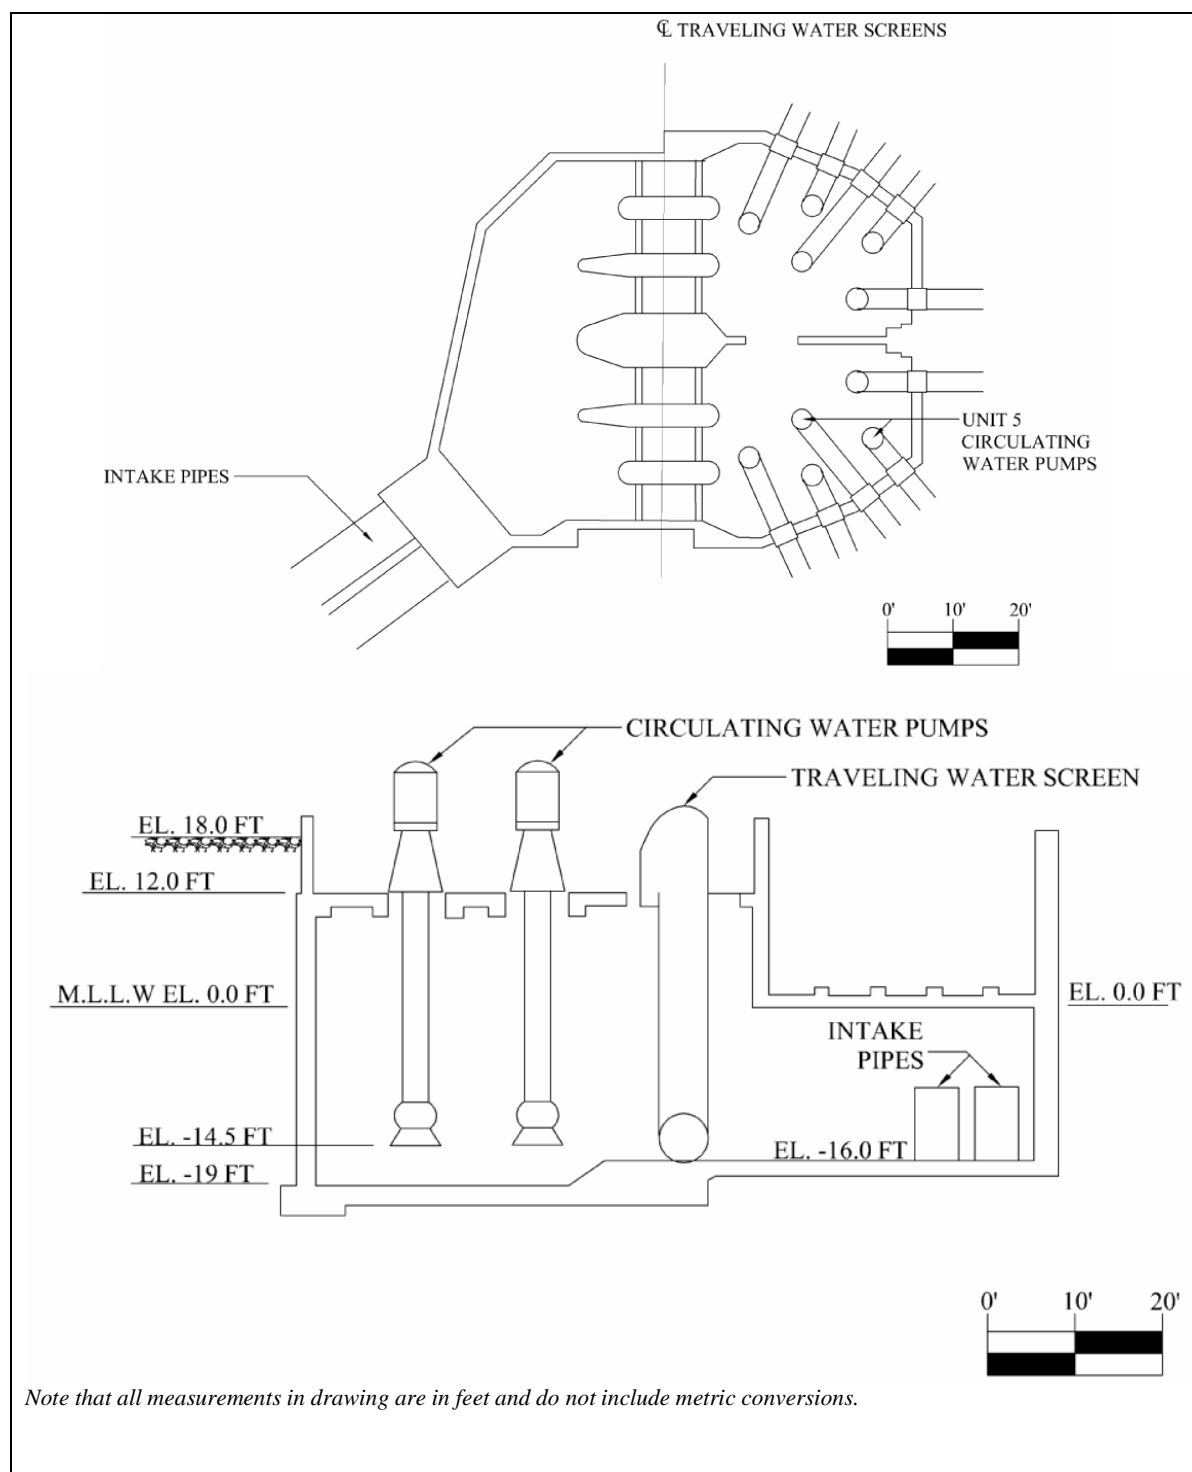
Plan view and cross section of HGS intake screenhouse.
